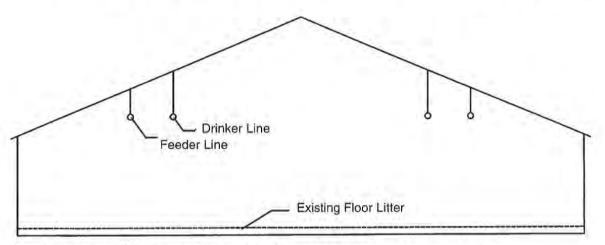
Cross-section of broiler house with feeder and drinker lines raised to ceiling.
